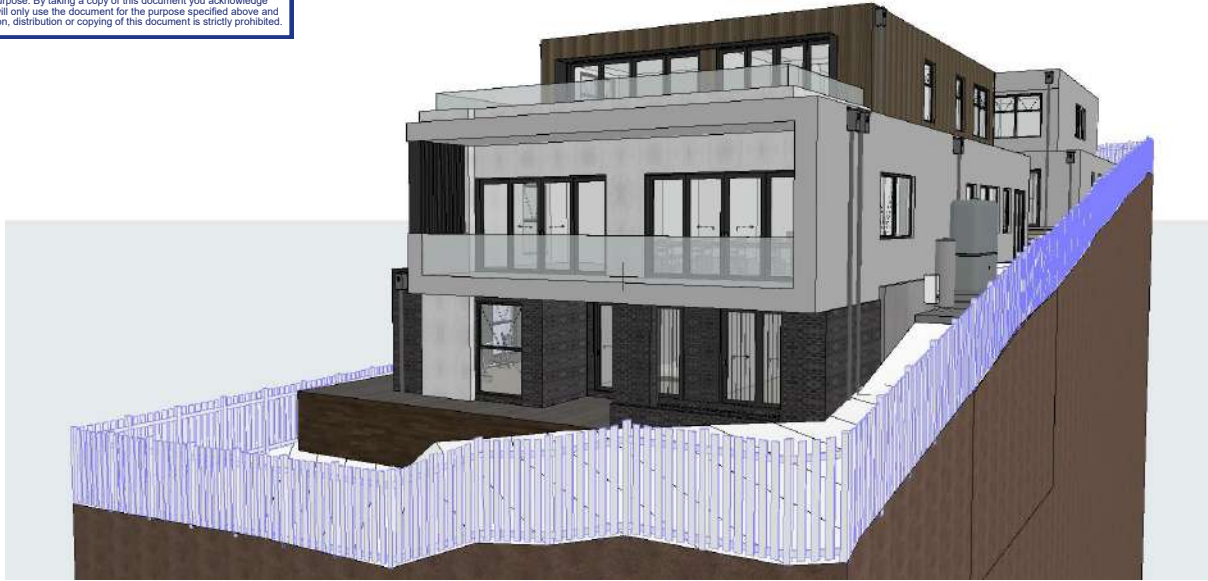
Artist Impression –Rear Perspective of Subject site. (South-West orientation)
